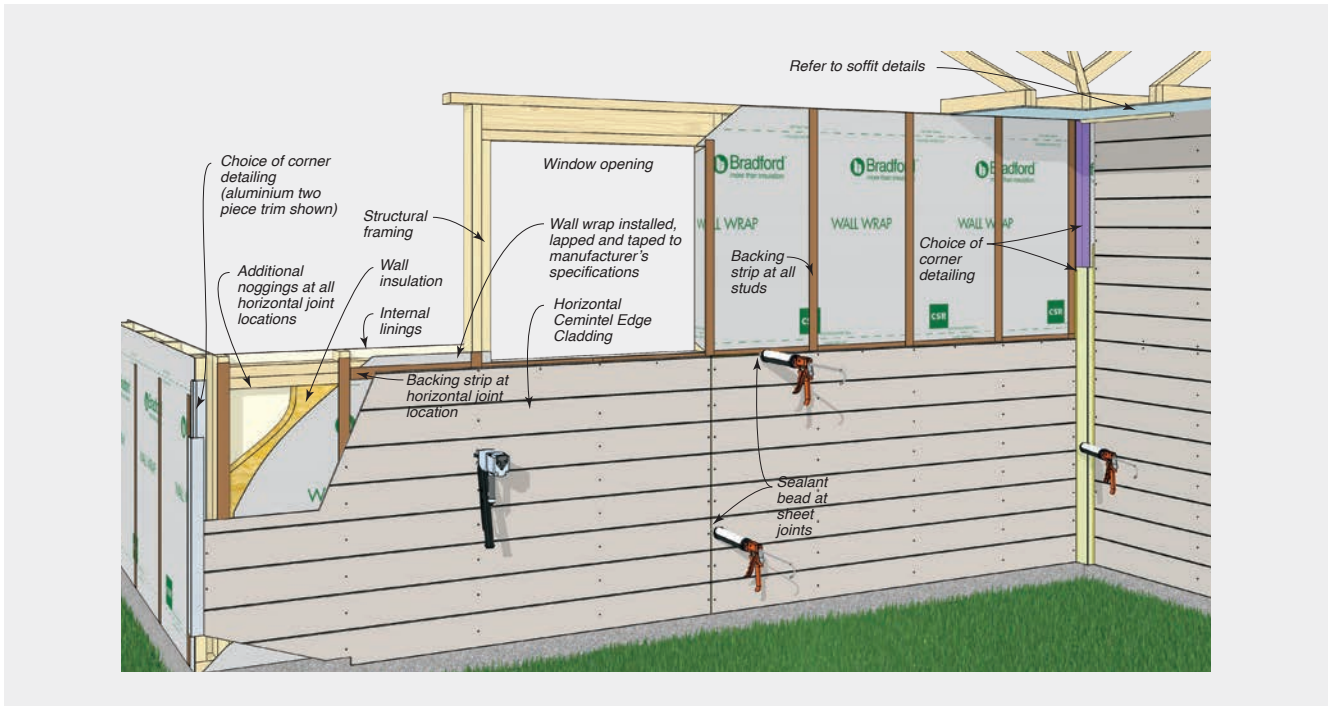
Typical Direct Fix timber - Vertical Joint
